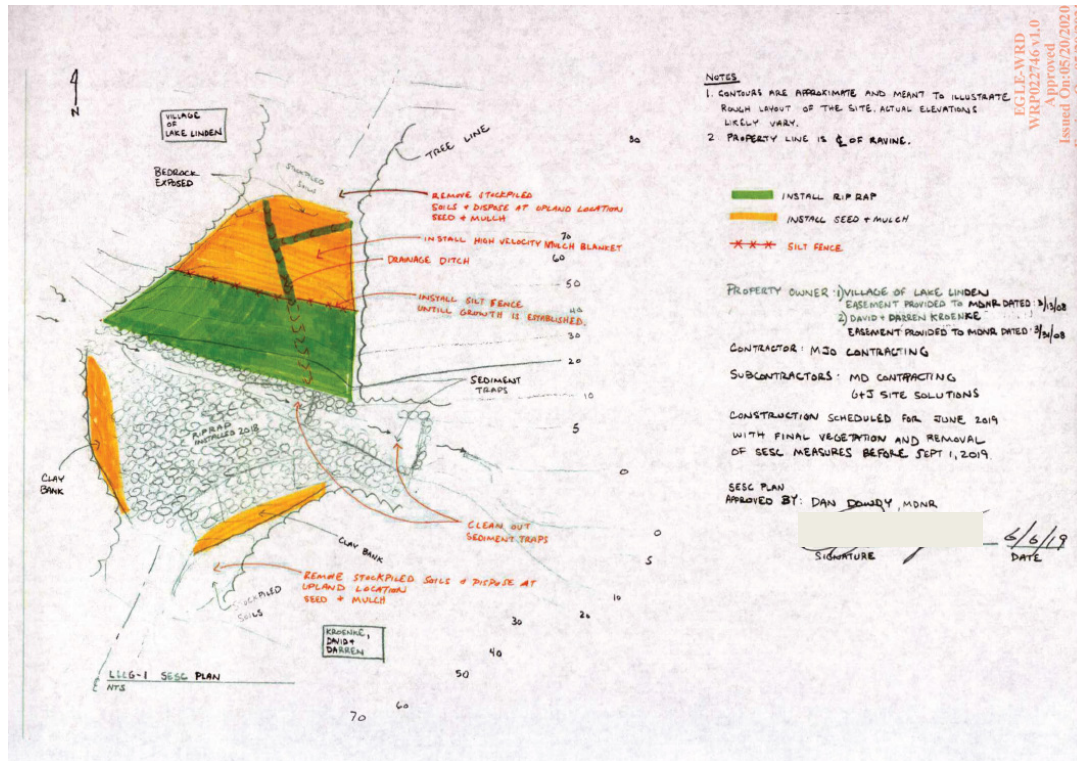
MDNR Rail Grade Plan – LLLG-1 [18].
